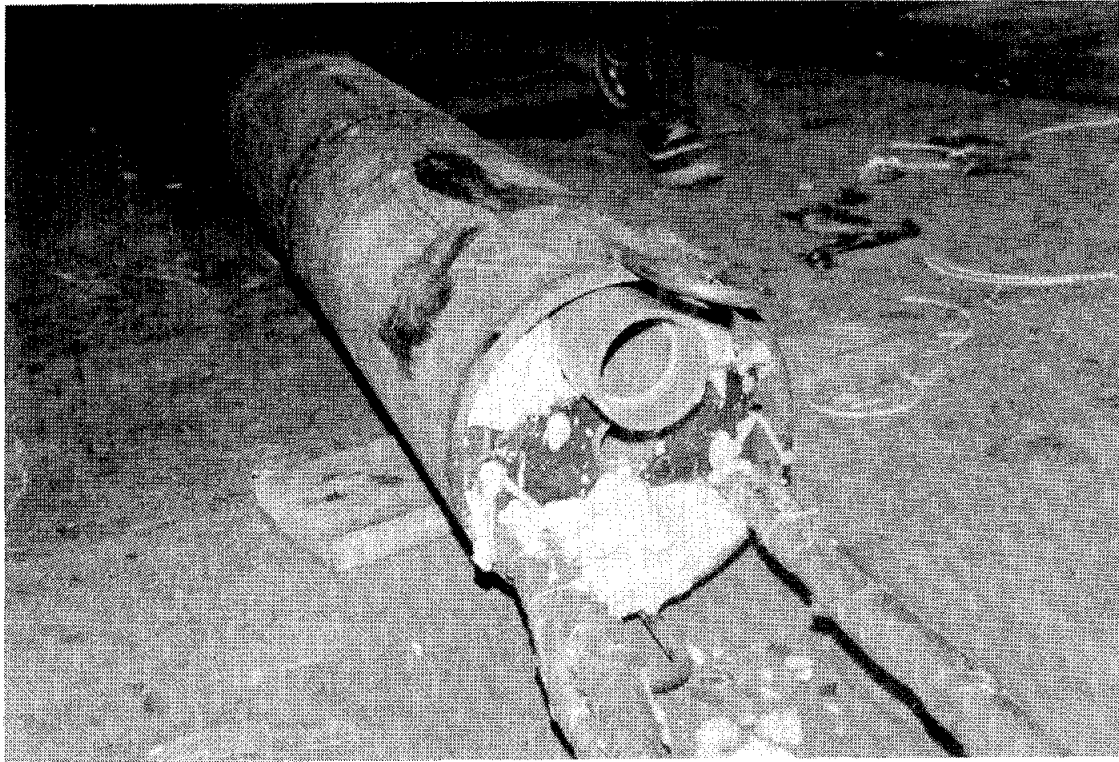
Instrumented pipe pile after welding of the three instrumented sections to the uninstrumented section and installation of the polyurethane foam.
